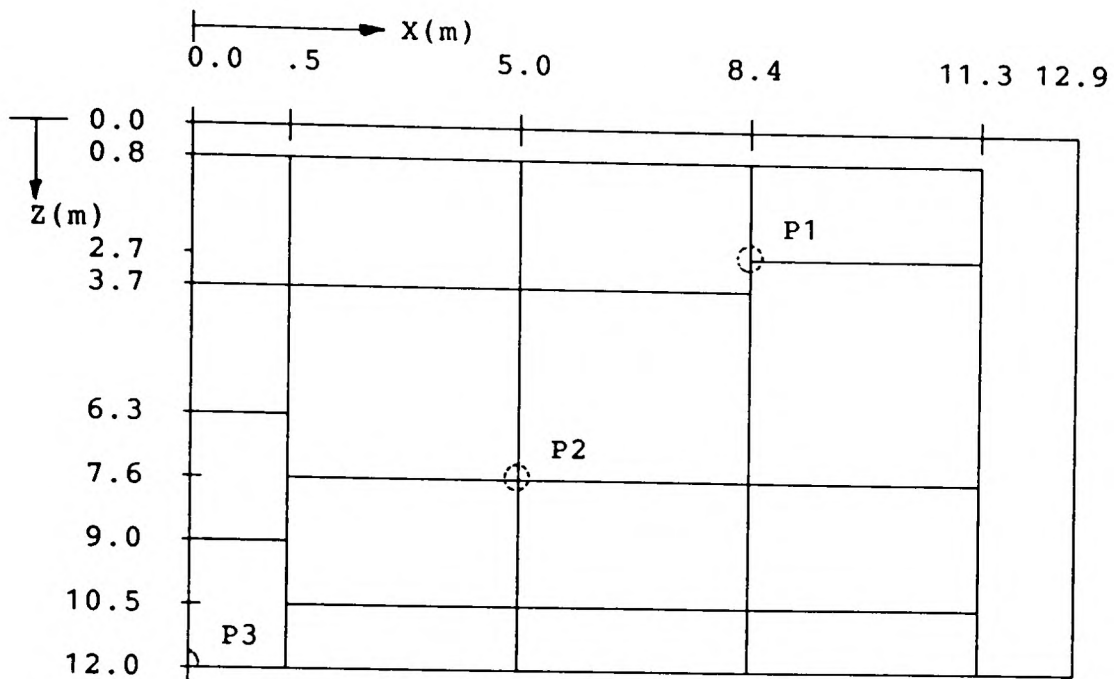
Plan Of Raft-Pile Foundation And Idealized Grillage Mesh.
